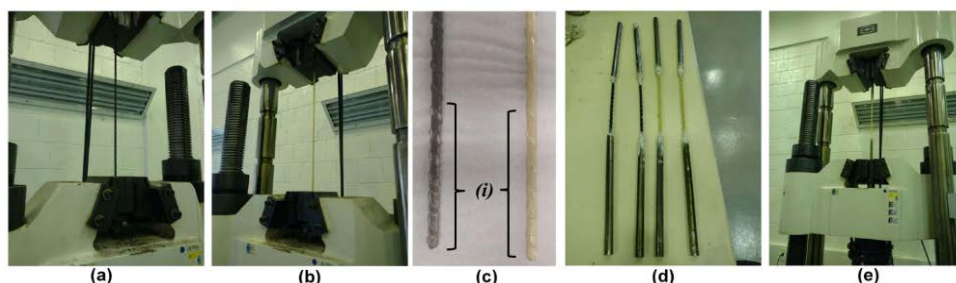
Tensile tests for the FRP rebars. BFRP rebar (a) and GFRP rebar (b) directly fixed into the clamps of the universal testing machine. (c) BFRP rebar (left) and GFRP rebar (right) after tensile tests showing the damage in the rebars (i) due to the slipping in the universal testing machine clamps. (d) Samples of BFRP rebar (left) and GFRP rebar (right) embedded in resin filled steel tubes (sleeves). (e) GFRP rebar with the resin filled steel tubes mounted in the universal testing machine for the tensile test.
